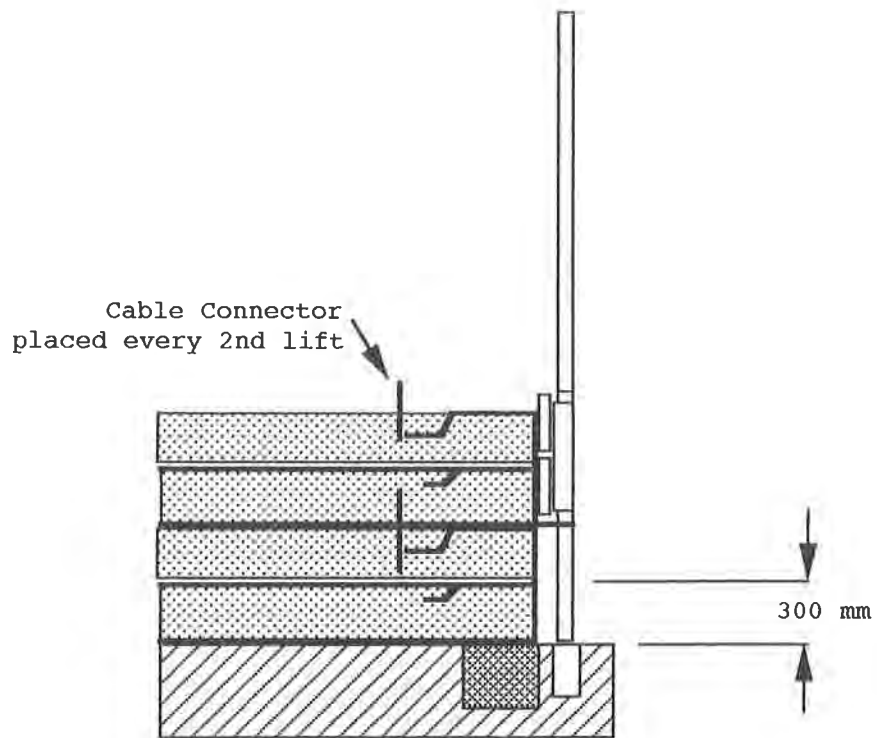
Wall Form Slid Vertical, Batter is Pivoted Vertical, Cable Attached to Vertical Support, Continue Construction
